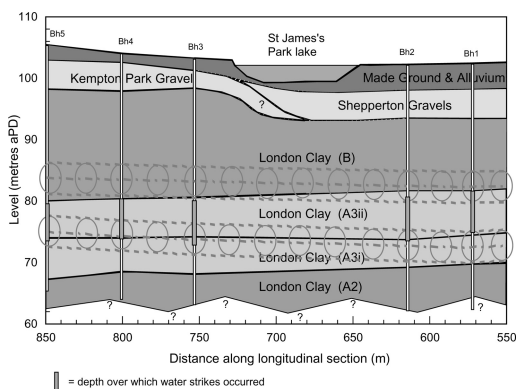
Section across St. James's Park site showing locations of water strikes and tunnel alignments.
